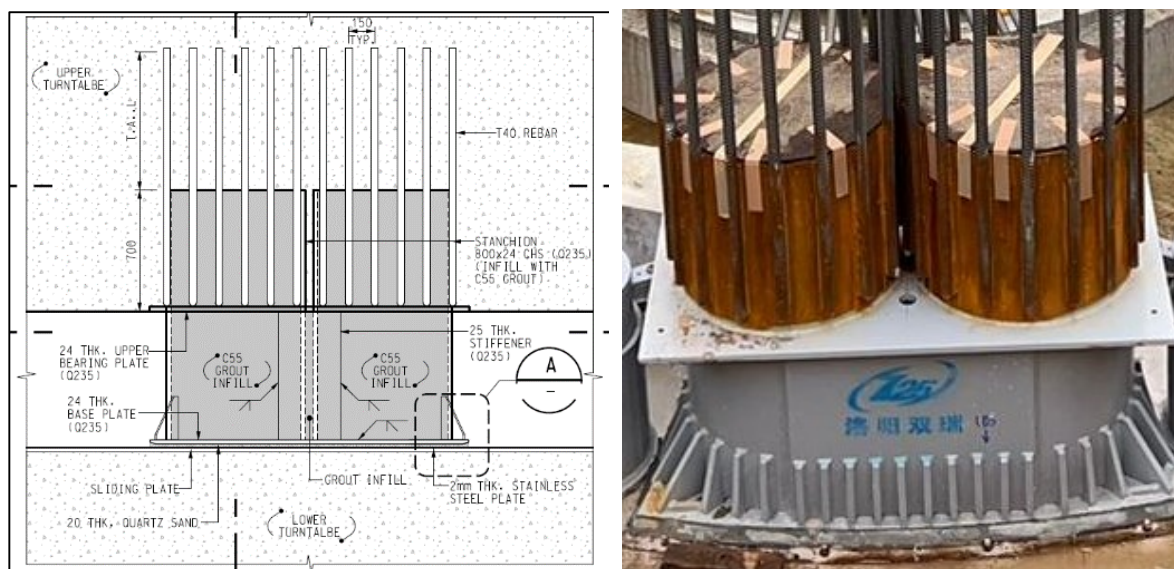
Details of stanchions adopted in CEDD Contract No. ND/2019/05
